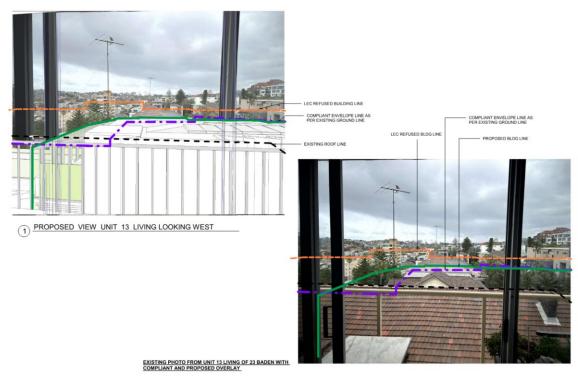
View analysis – 13/23 Baden St living room – view 2 (Source: Legge & Legge Architects)
